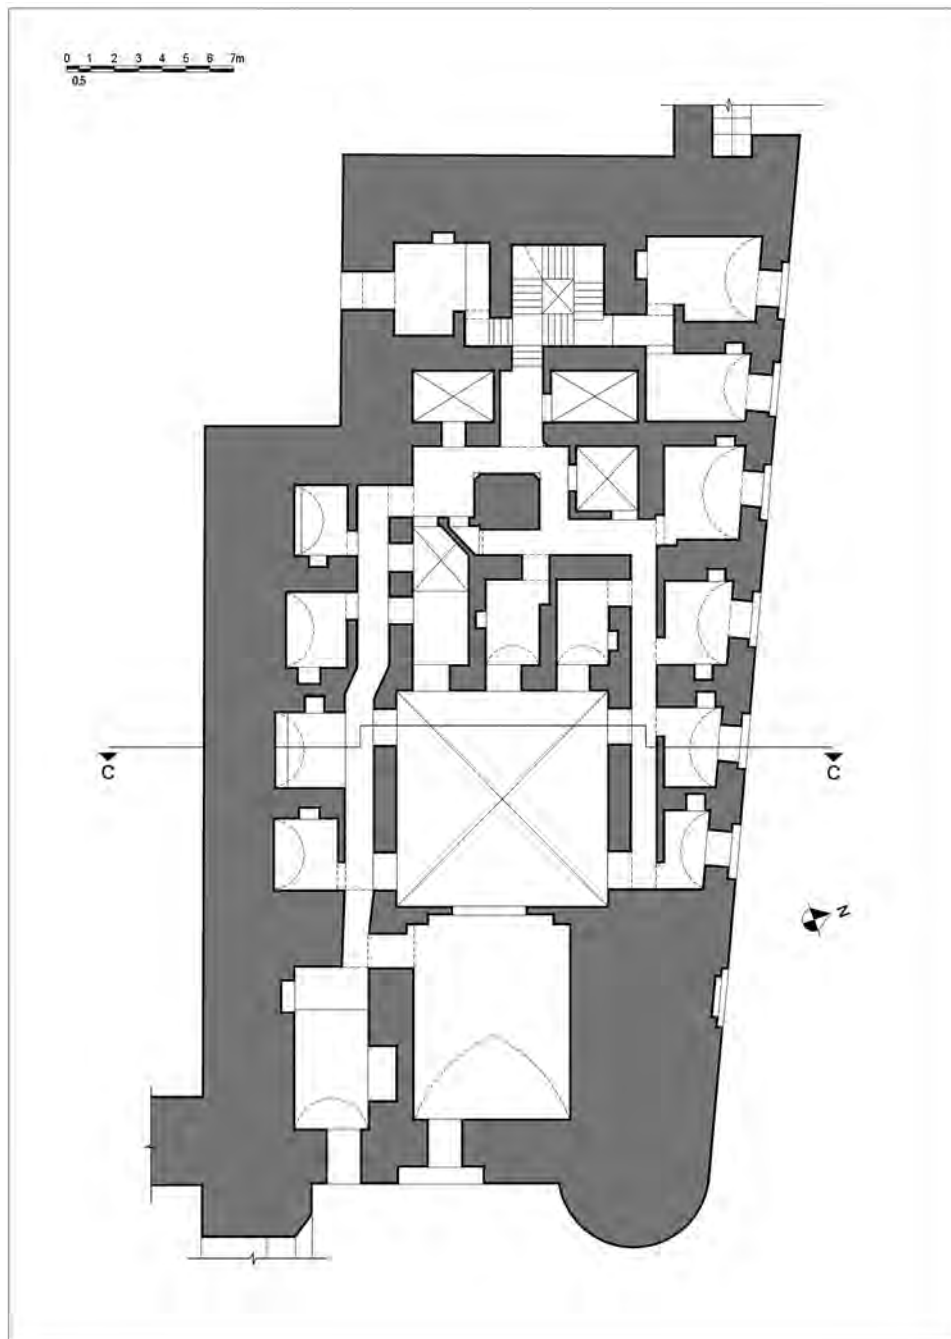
Shāfi'iyah Madrasah, Complex of Sultan Ḥasan, Cairo, third floor plan (H. Al-Harithy)
